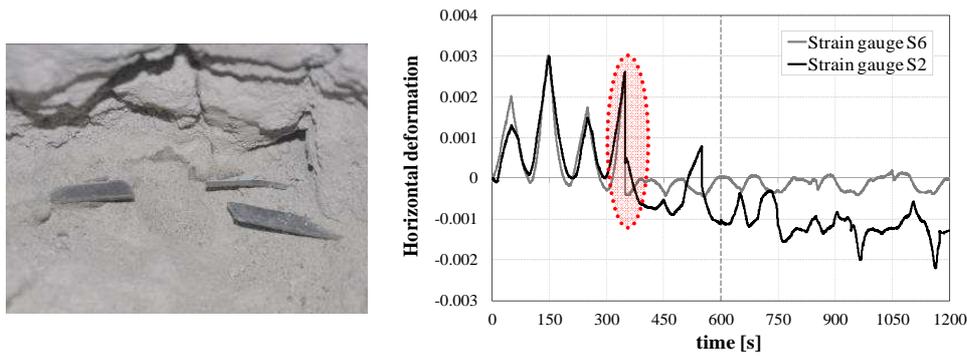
Picture of the failures of the horizontal reinforcement (left) and horizontal deformation recorded by the strain gauges (right)
